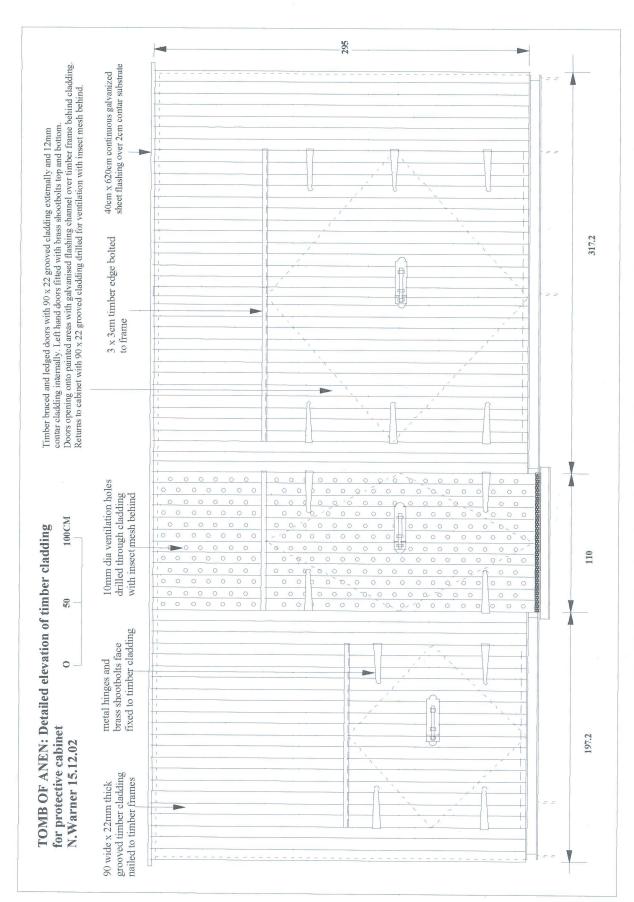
Detailed elevation of timber cladding for protective cabinet
